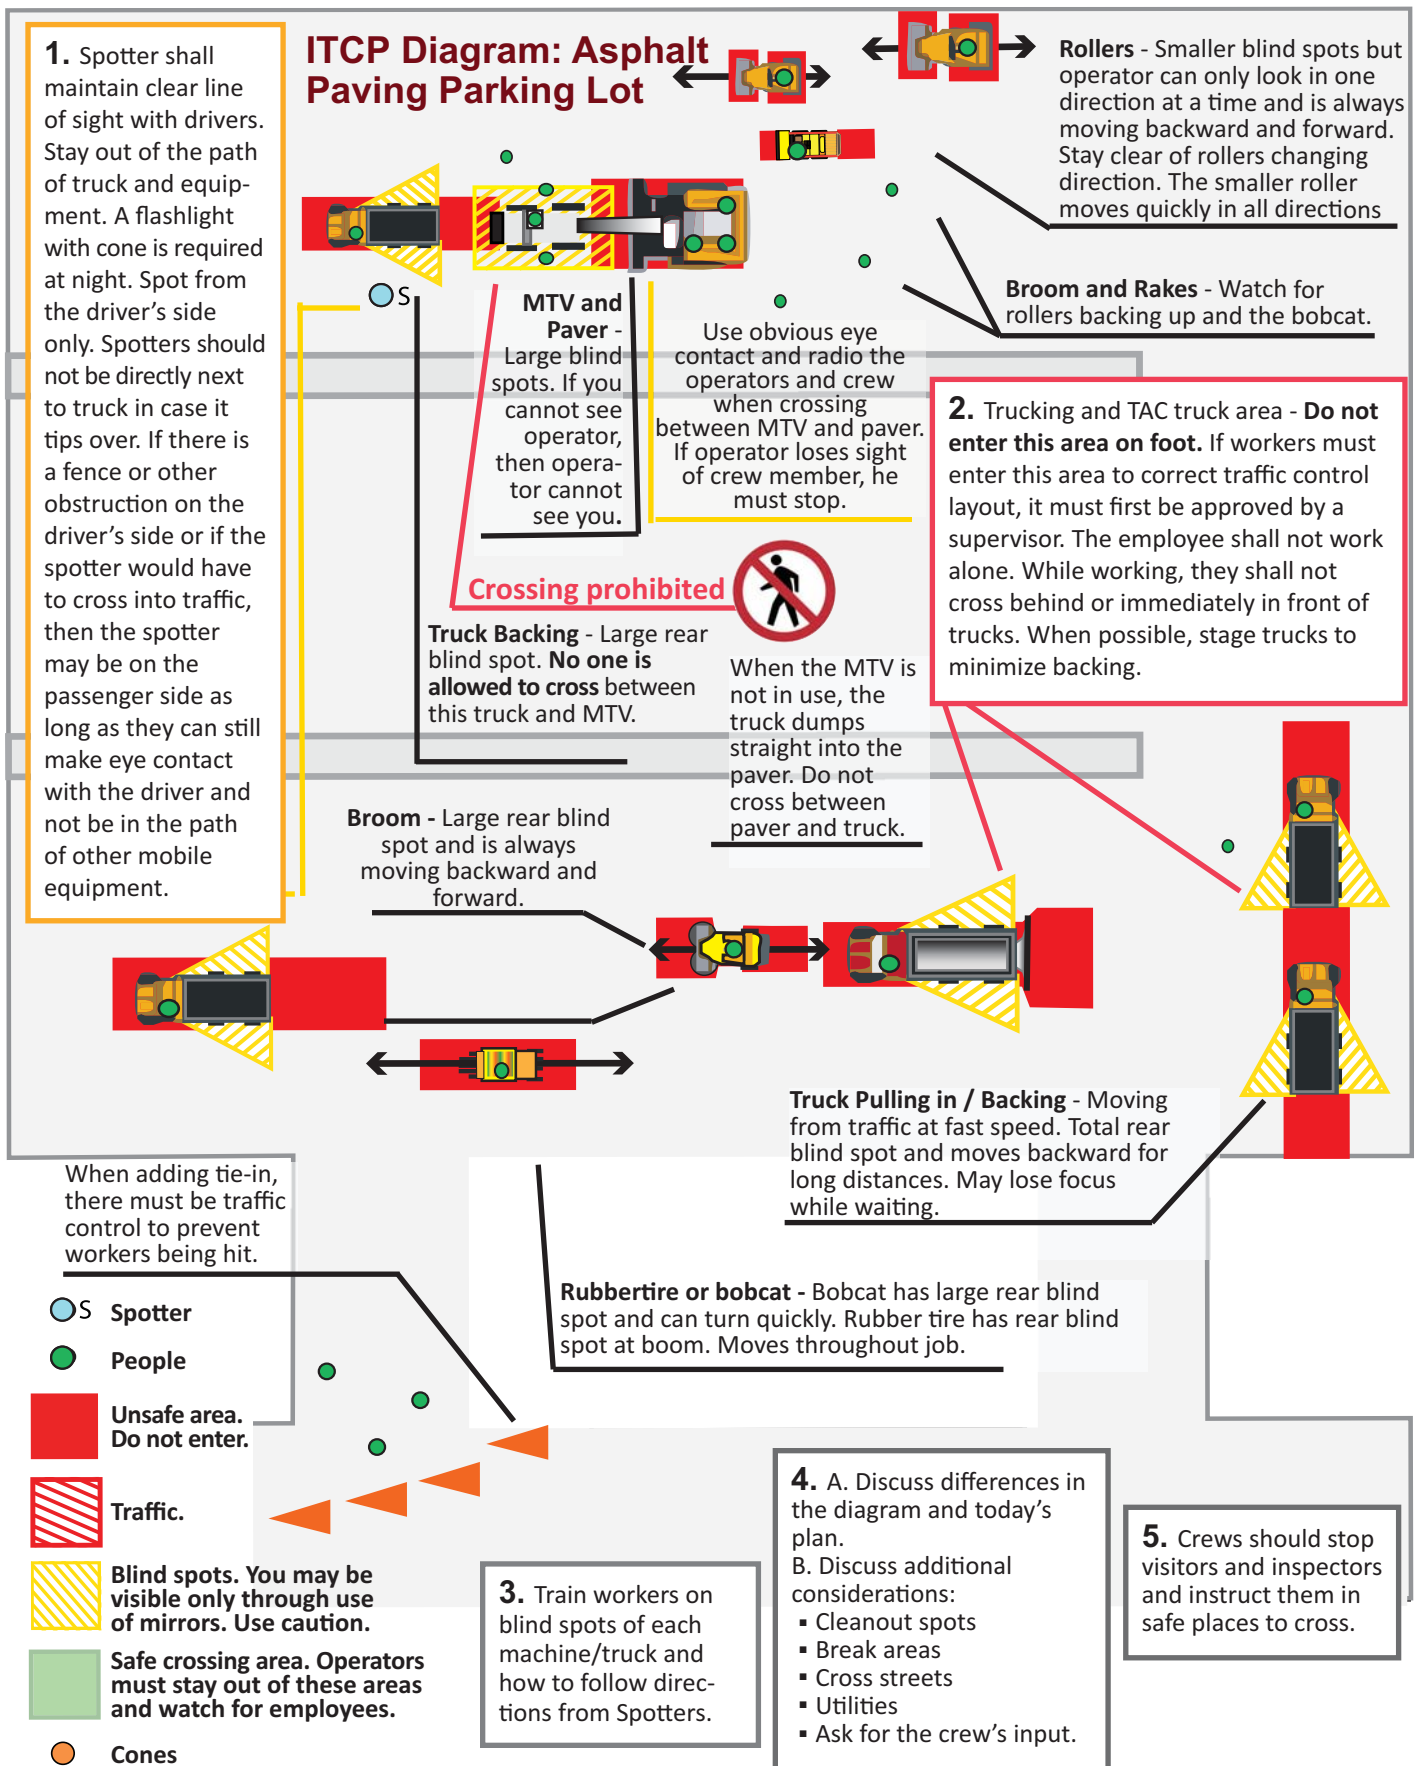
Example diagram of vehicle, equipment, and worker locations and movements for an asphalt paving parking lot (Source: Adapted from Barriere Construction, *Safe Zones*, 2014)⁶
